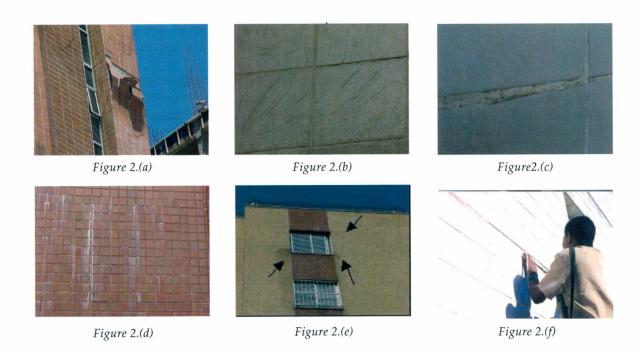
Facade main defects. (a) Bond failure. (b) Crazing of ceramic tile glaze. (c) Surface cracking of grout material. (d) Efflorescence. (e) Structural movement cracks. Marked by arrows, we can see diagonal cracking originating at a corner of window and horizontal cracks coinciding with the intersection of the top of the back-up wall and structural element above. (f) Failure of movement joint.
